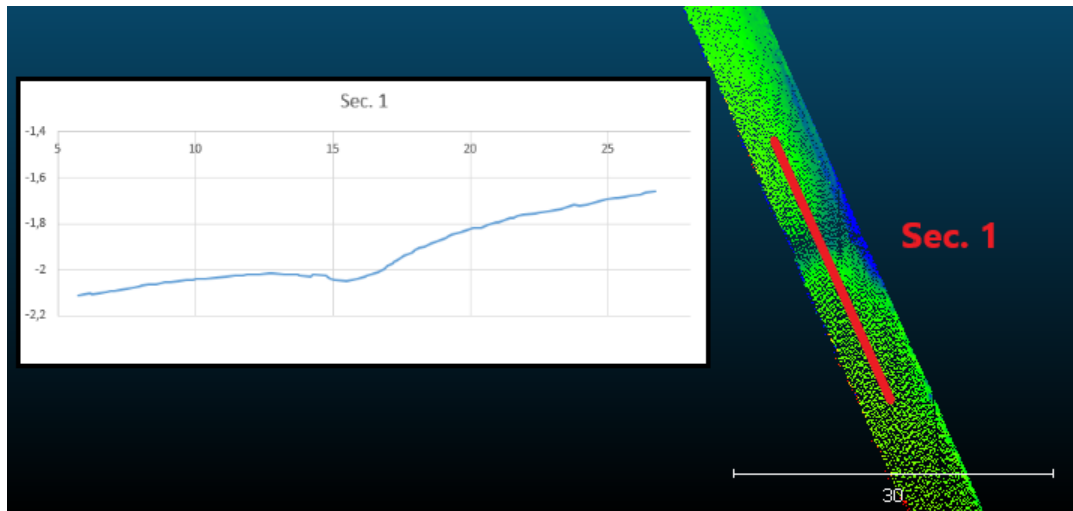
Longitudinal profile of the road surface in the area of pavement subsidence
